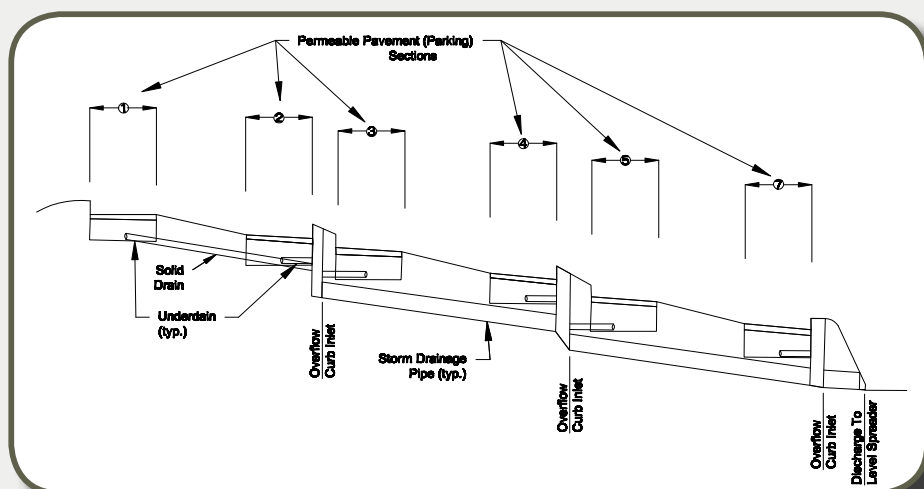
Cross Section of Sub-Areas 1 through 5 and 7
